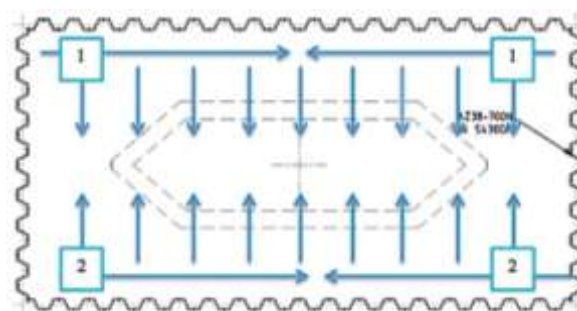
Compaction inside steel caisson (13 m x 26 m) from the perimeter towards the center.
